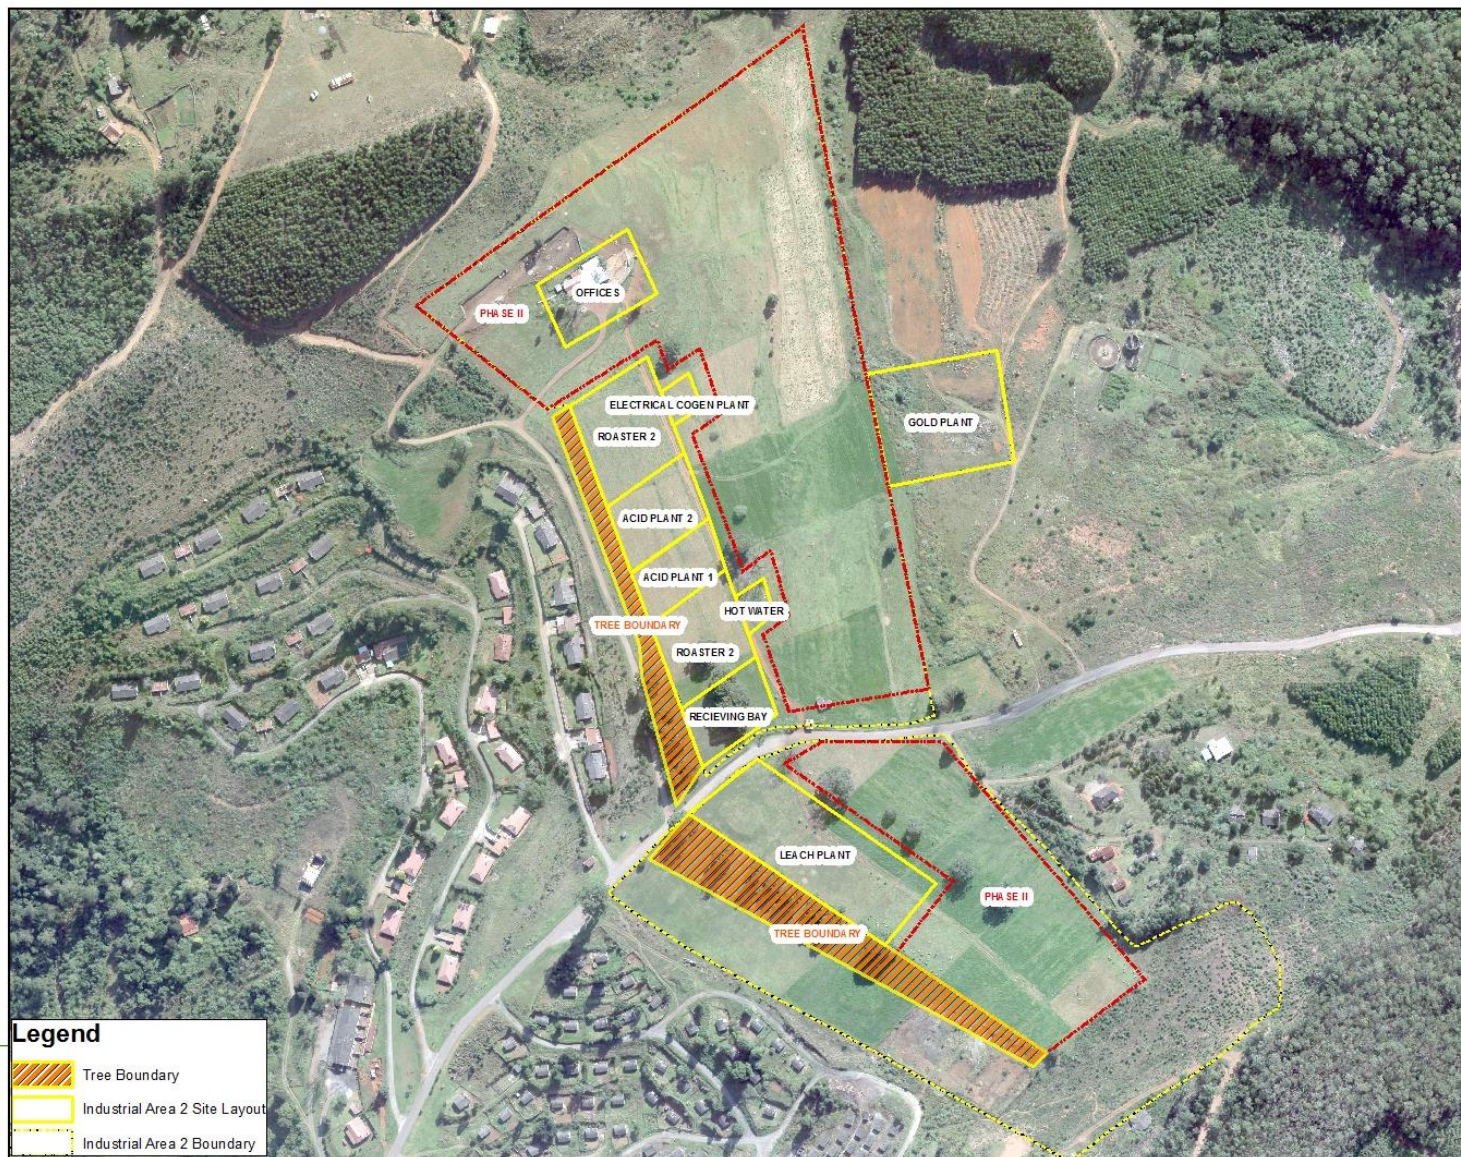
shows the proposed site layout for Industrial Area 1 while Figure 6 shows the proposed site layout for Industrial Area 2.
